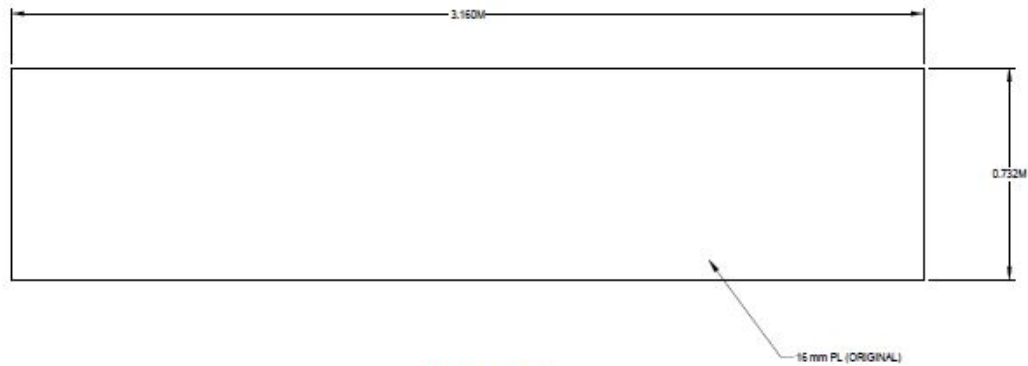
Typical Deck Panel in the Dock's Second Most Outboard 1 Bay
